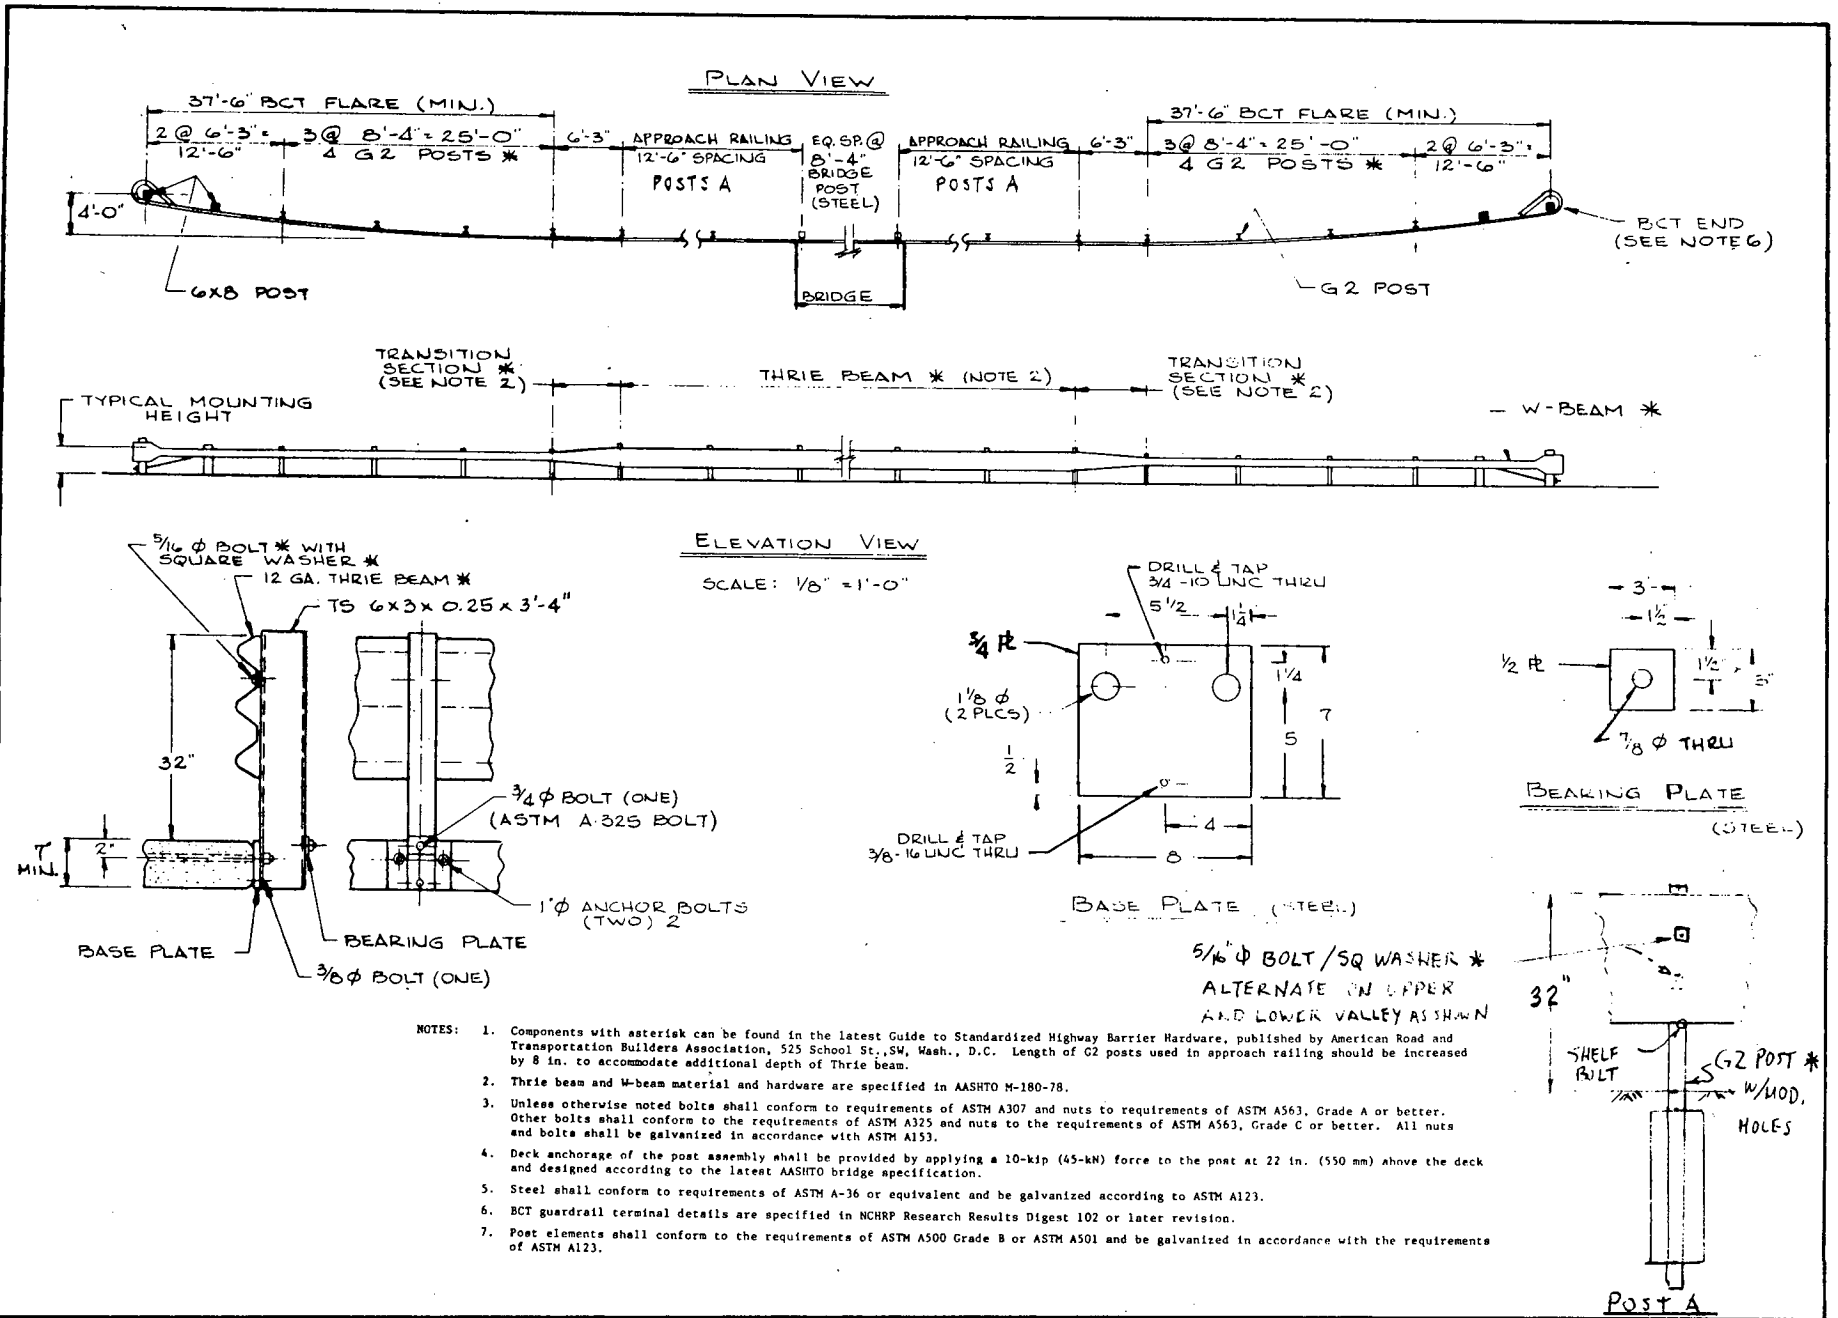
Thrie beam/weak post guardrail—SL1 bridge rail transition.
